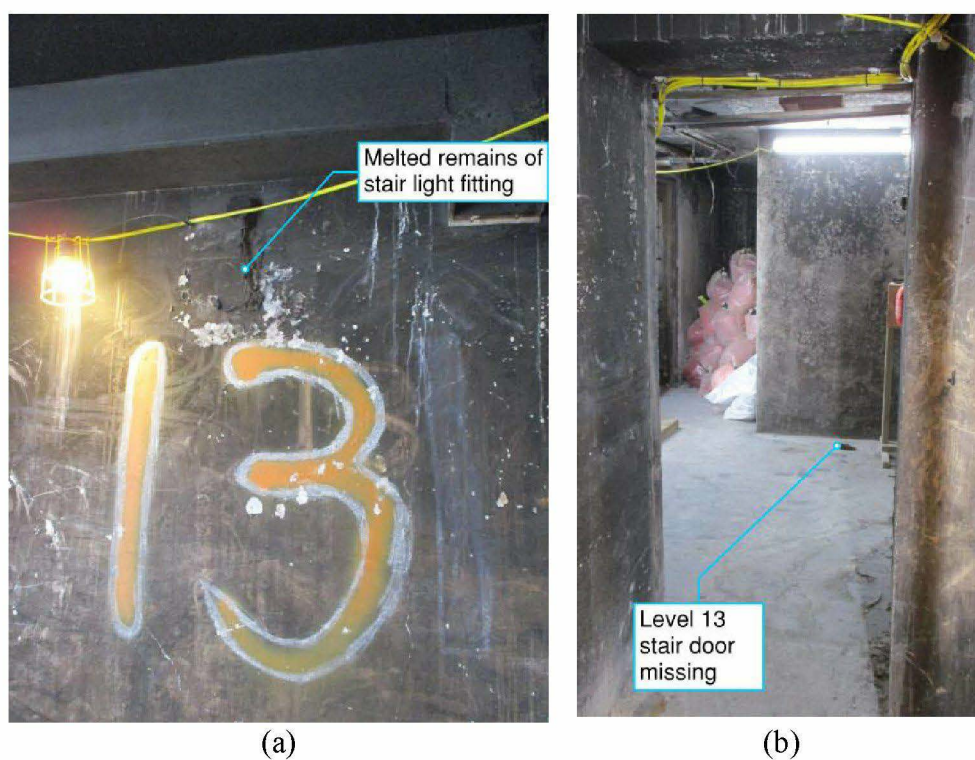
(a) Stair light fitting condition and (b) door condition on Level 13
